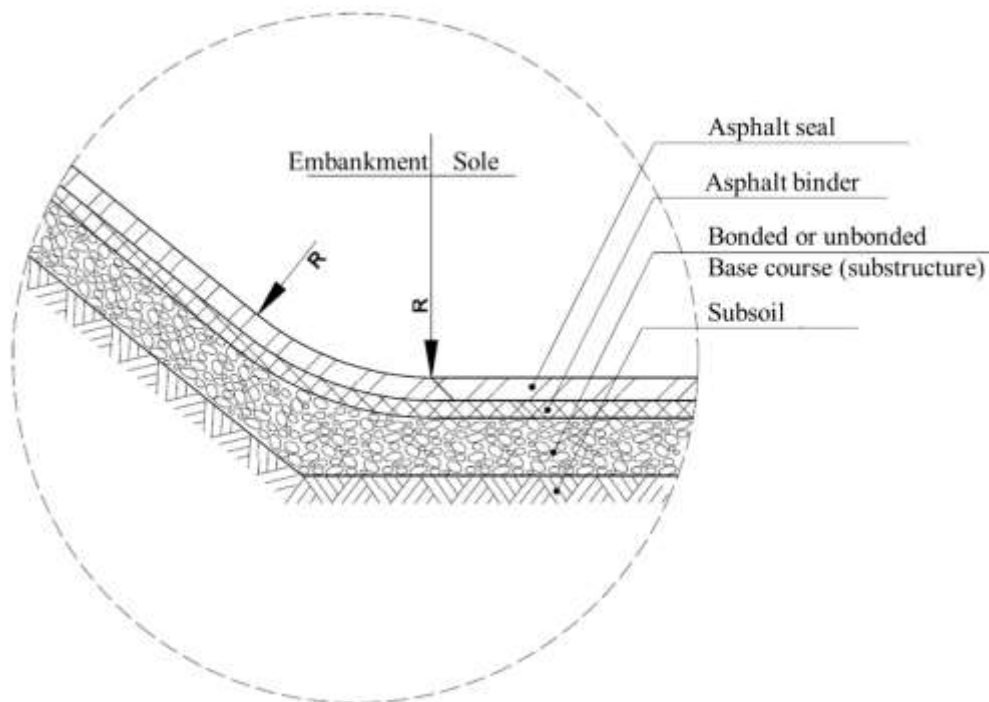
Asphalt outer seal of a power plant channel (detail of Figure 6) (DGGT, 2008)
